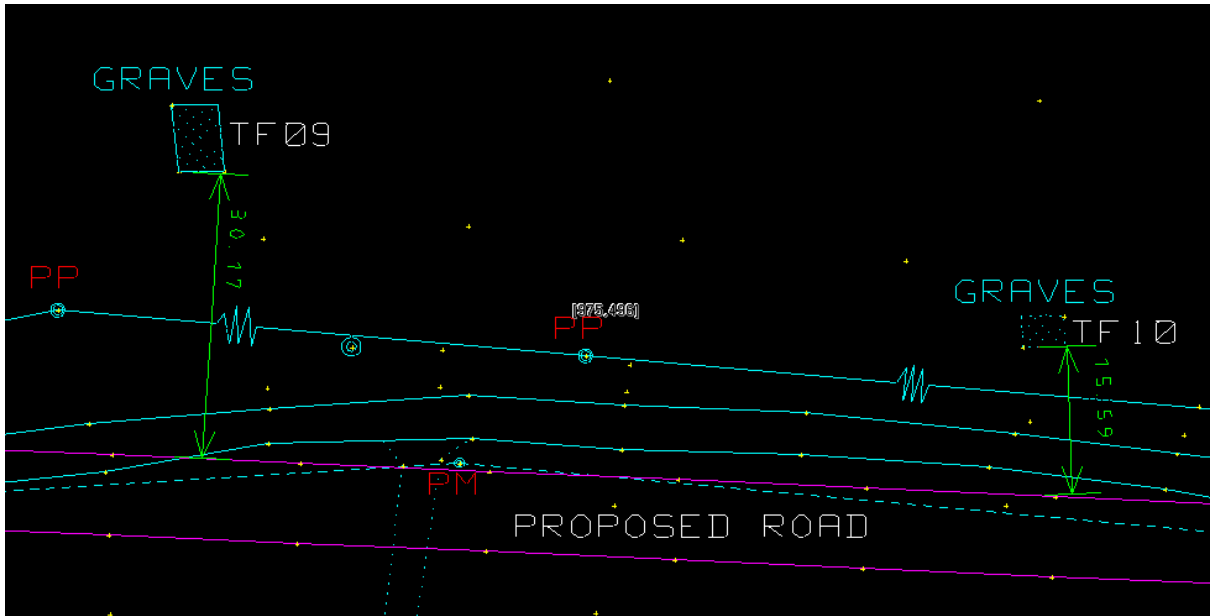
Position of grave sites TF09 and TF10 adjacent to the new road alignment (Source: Neil Brand).
